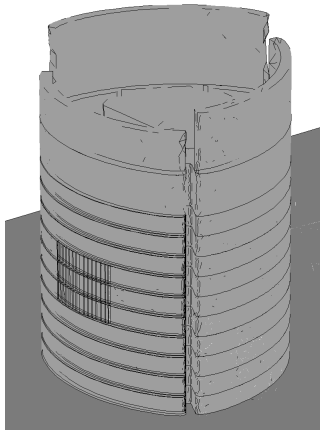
Perspective view of the building: Top 10 floors including roof structures
